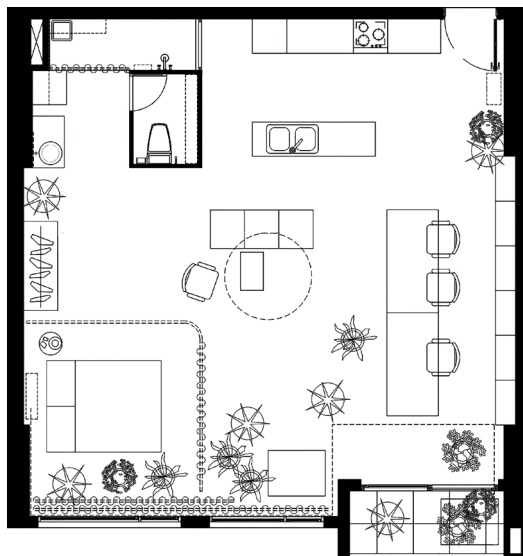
Curtain Wall Apartment, Belgrade, Studio Alfirević, 2019 (Source: www.alfirevic.com)
